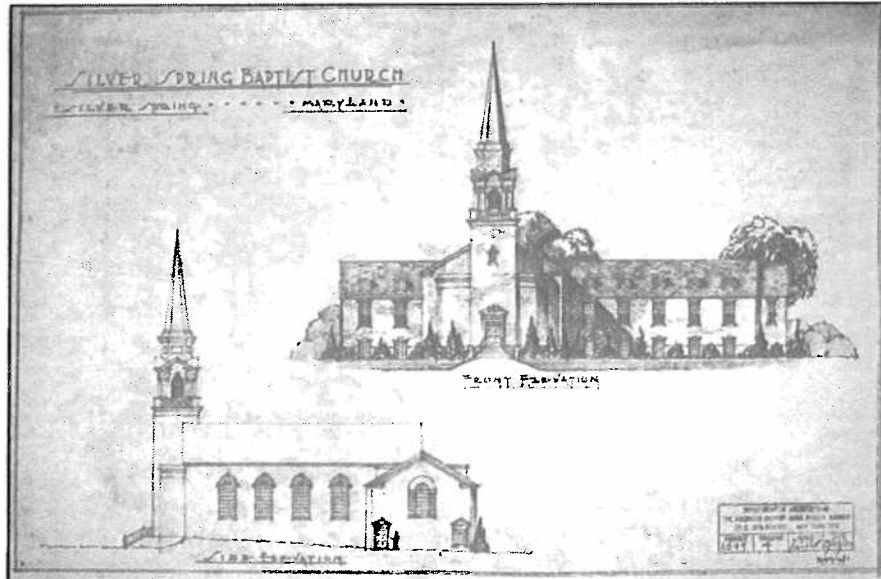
1930 American Baptist Home Mission Society proposed new church elevation drawing.
